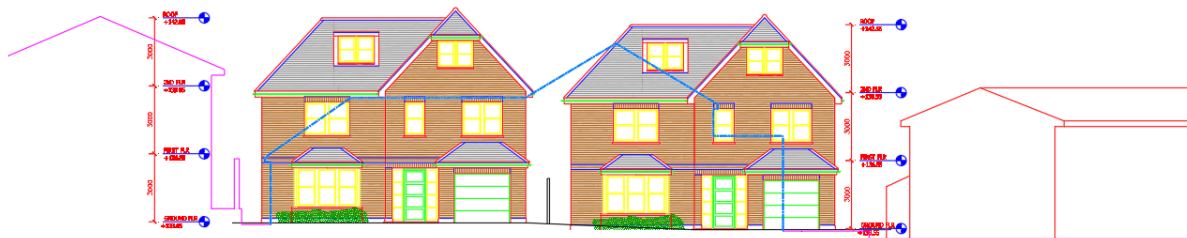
showing the proposed elevations with dual fenestration and roof lights where practicable.
